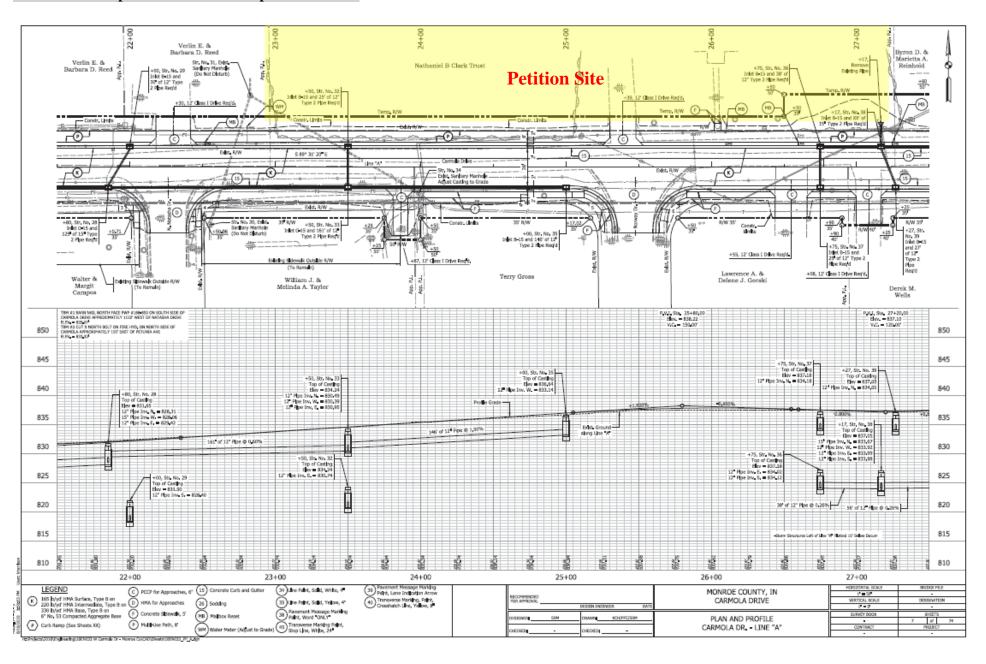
Proposed Carmola DR Improvement Plan
